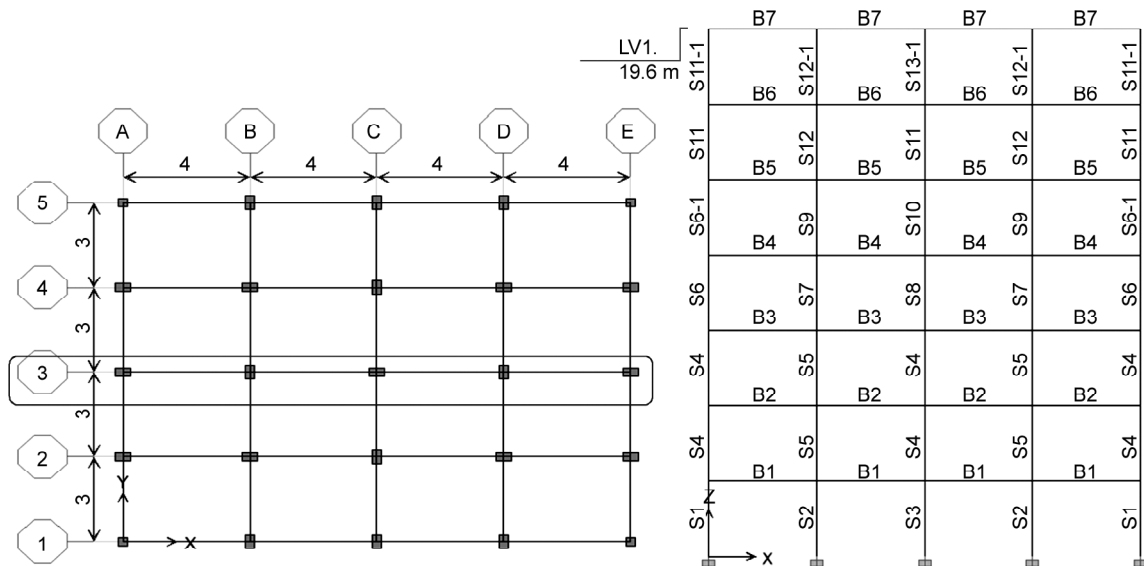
Building details - plan, elevation and member nomenclature of seven storey building.
